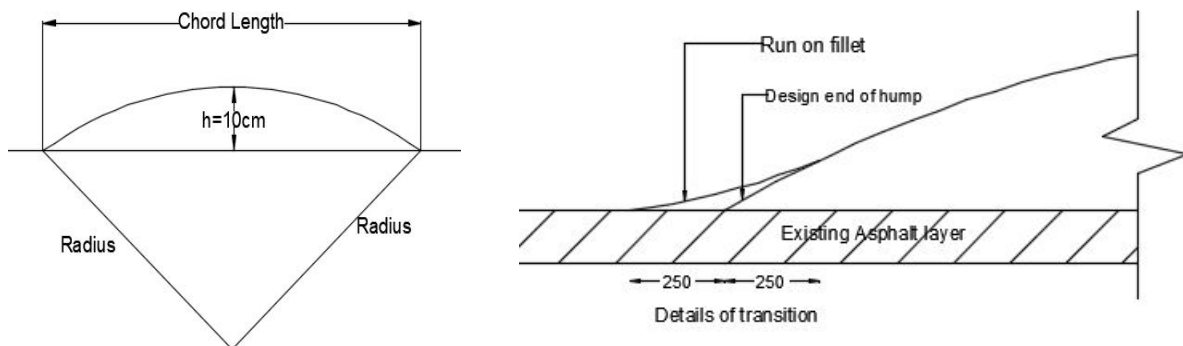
Speed bump dimensions to be adopted on Farm Road & Access Road
